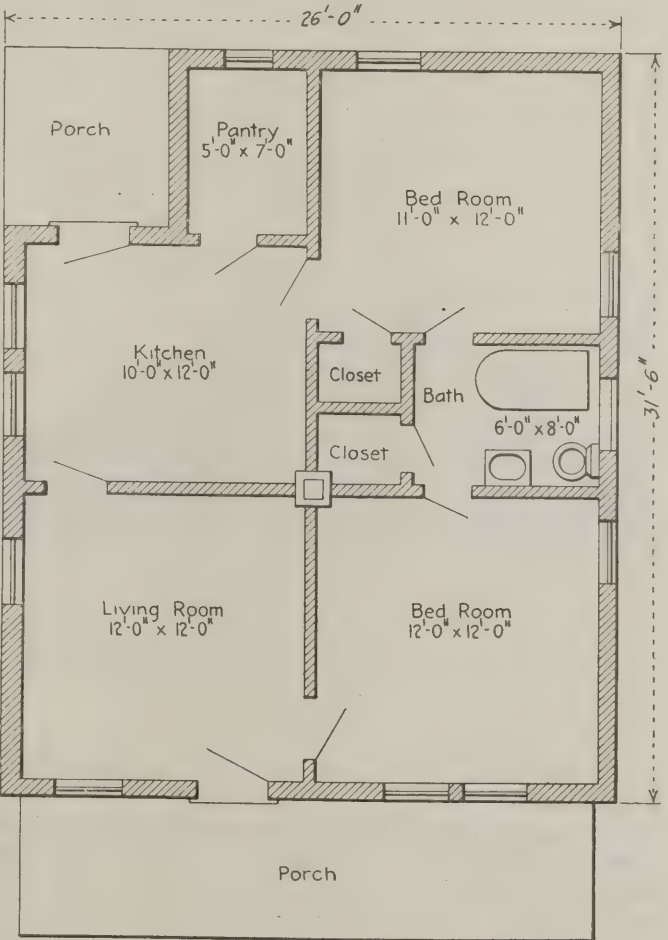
PLAN OF THE STANDARD MINER'S HOUSE
